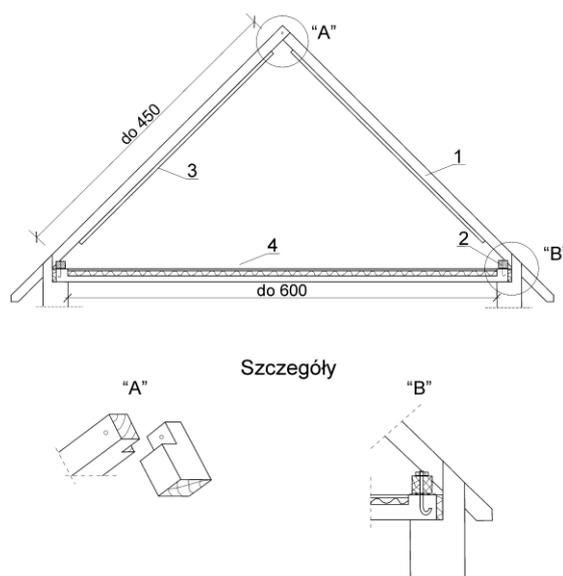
Rafter roof with plates: 1 - rafter, 2 - plate, 3 - wind brace, 4 - concrete ceiling
